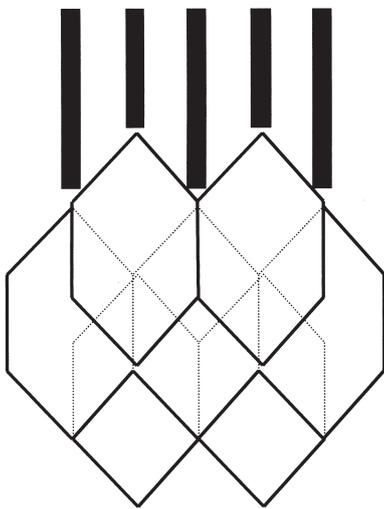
Stone roof tiles arranged in diamond pattern showing underlying alignment of rafters.
